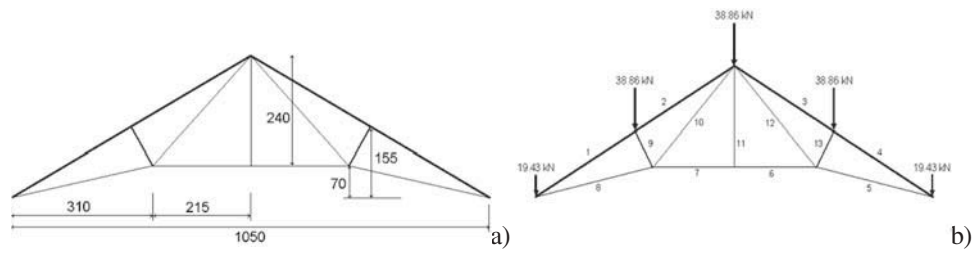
(a) Truss geometry (uom: cm); and (b) truss static model.
